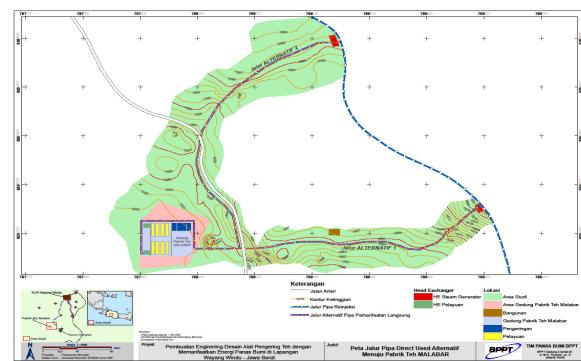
Possible Piping Layout from Brine to Tea Malabar Factory
